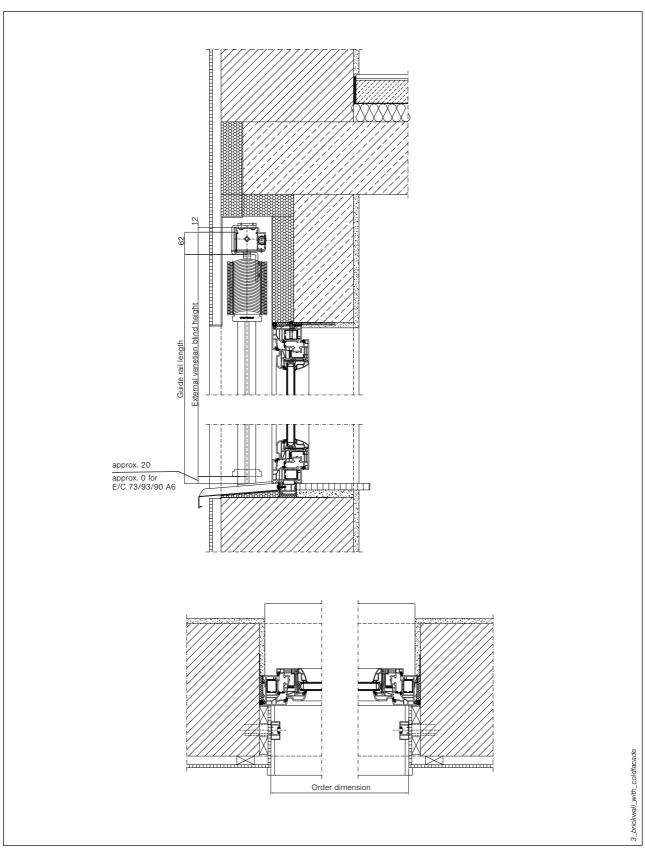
Fixing via self-supporting top rail installation SE - type E 80 A6 S in on-site notch
